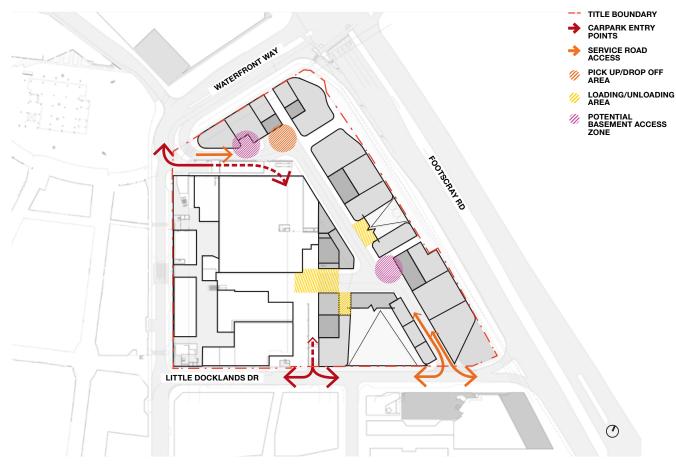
Movement and Parking Plan 8 - Access to car parking spaces, loading areas and pick up/drop off points
